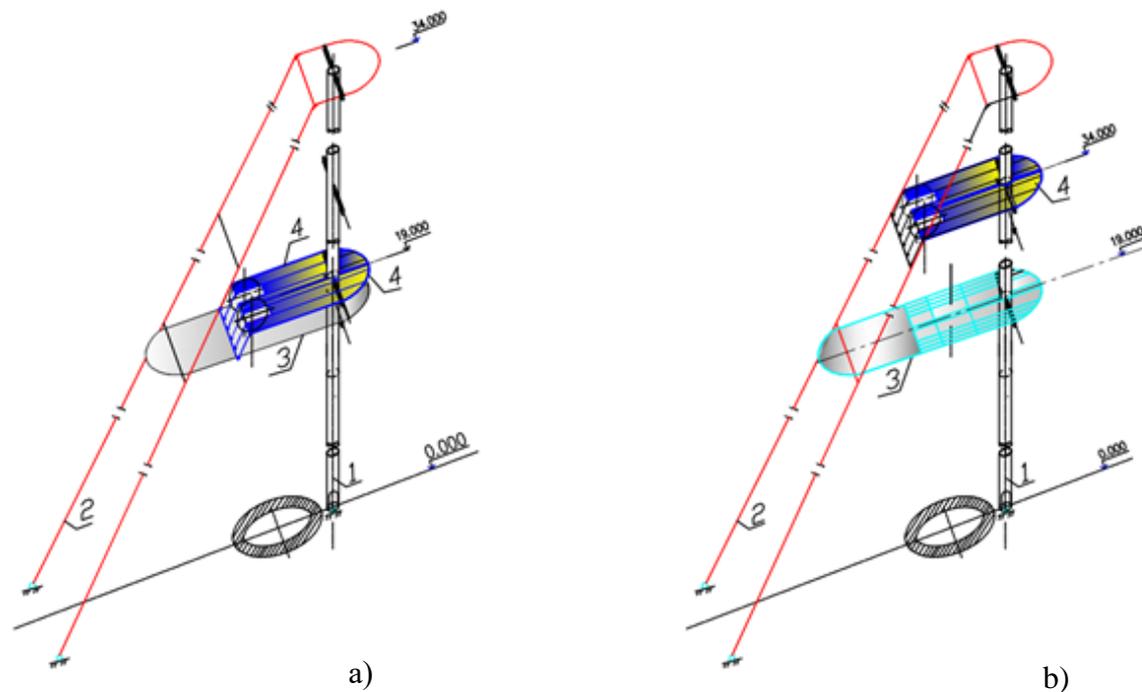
Scheme of assembly of permanent sheave wheels platform: a – assembly on driving sheave wheels platform; b – erecting to project position; *1* – central tubular post; *2* – stay leg, *3* – driving sheave wheels platform, *4* – permanent sheave wheels platform
